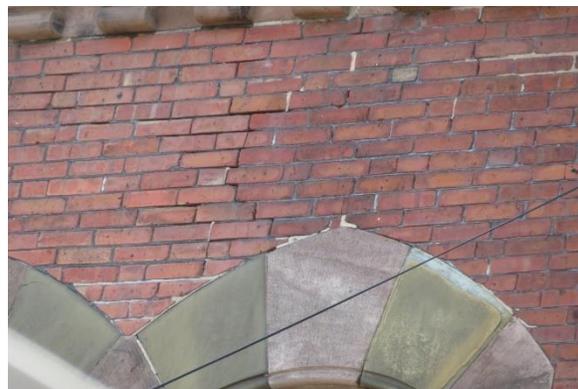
West façade: Step crack in brick masonry. Stone delamination. Weathered mortar joints.
